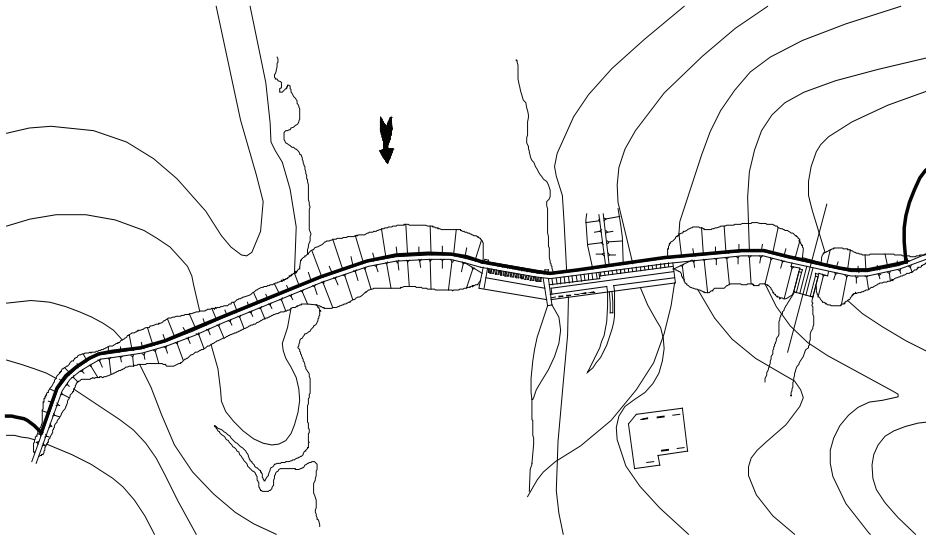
Typical layout for a very wide river valley (Tucuruí hydropower plant, Tocantins River, North of Brazil).
